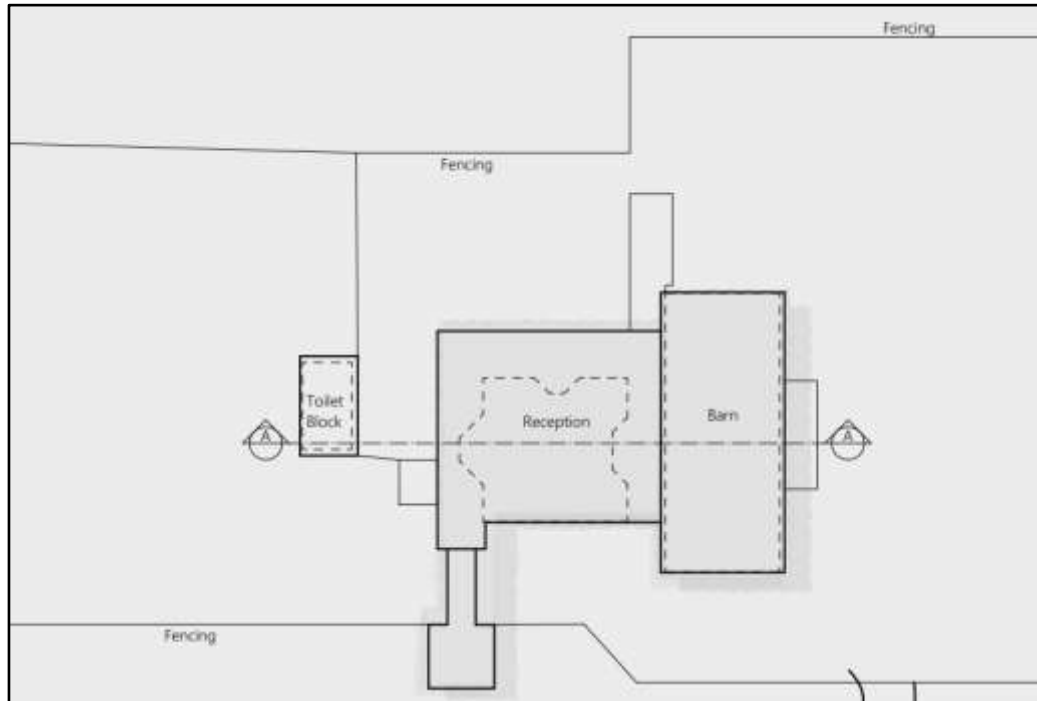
Architectural plans of the wedding venue (Source: Spooner Architectural).
